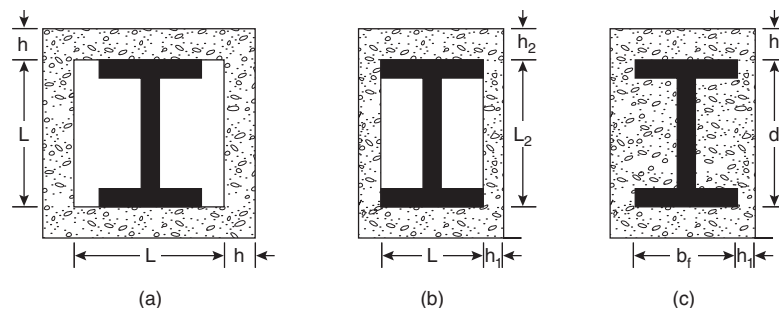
Concrete-protected structural steel columns. (a) Square shape protection with a uniform thickness of concrete cover on all sides; (b) Rectangular shape with varying thickness of concrete cover; and (c) Encasement having all re-entrant spaces filled with concrete.
